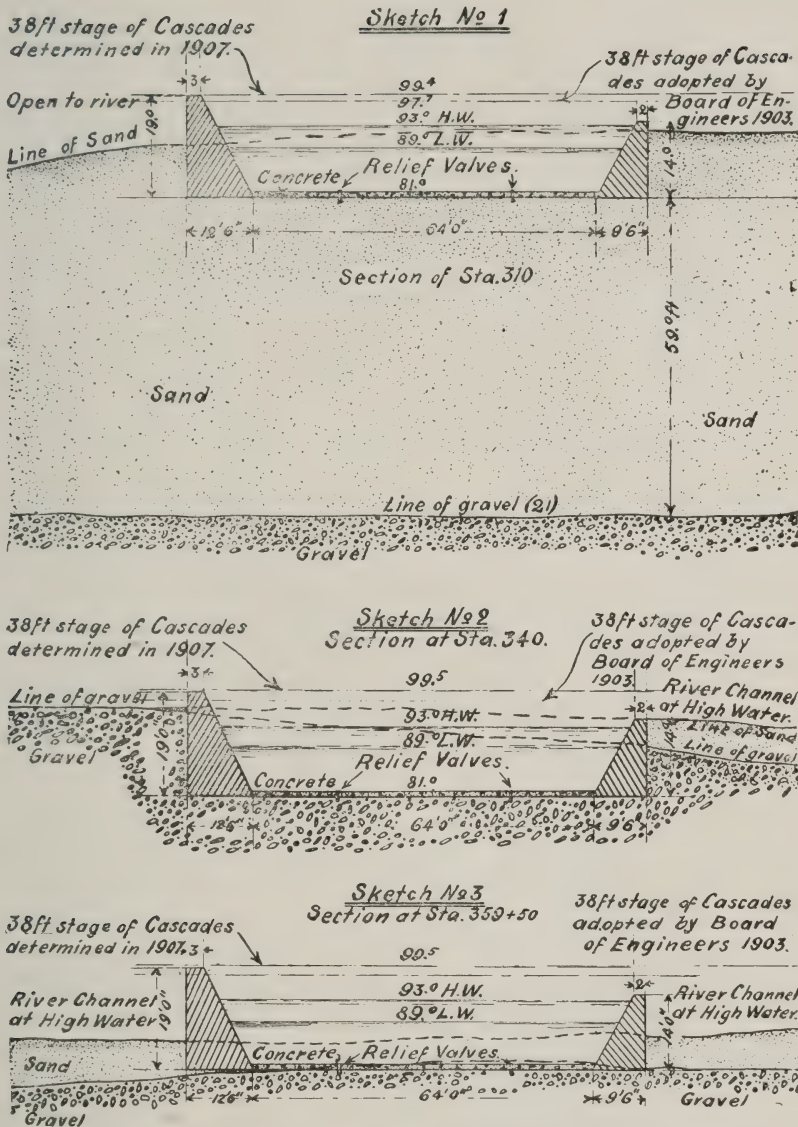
Typical cross sections of canal walls and floors in sand and gravel, as adopted originally by Board of Engineers. Disposition of excavated material not shown.
